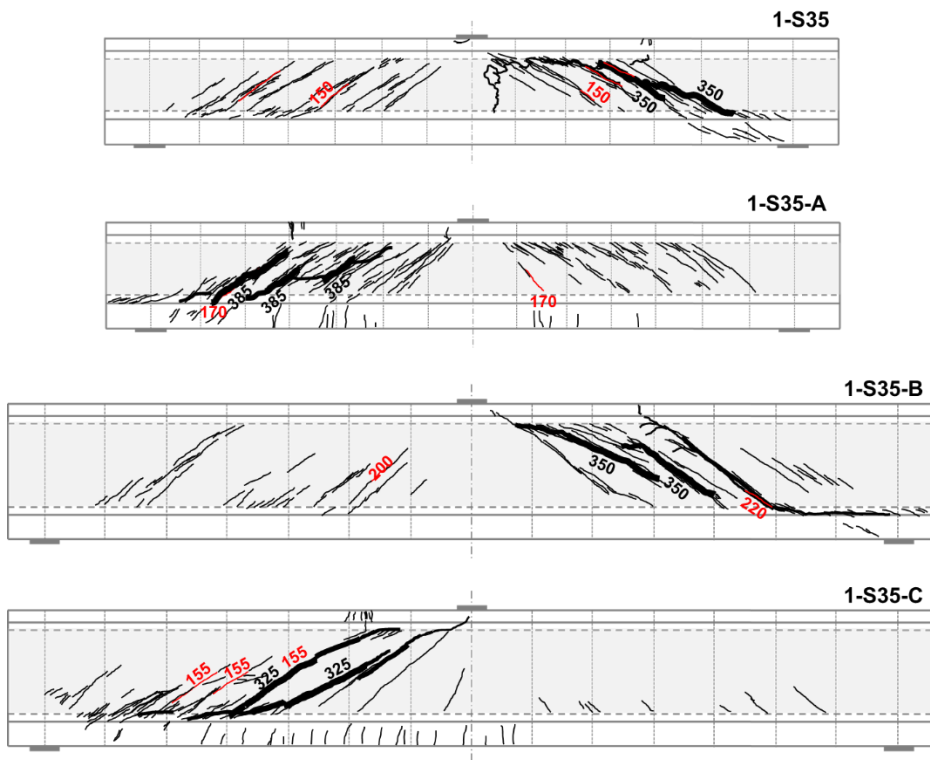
Crack pattern and location of critical shear crack in web of 1-series specimens regarding to the longitudinal reinforcement ratio
